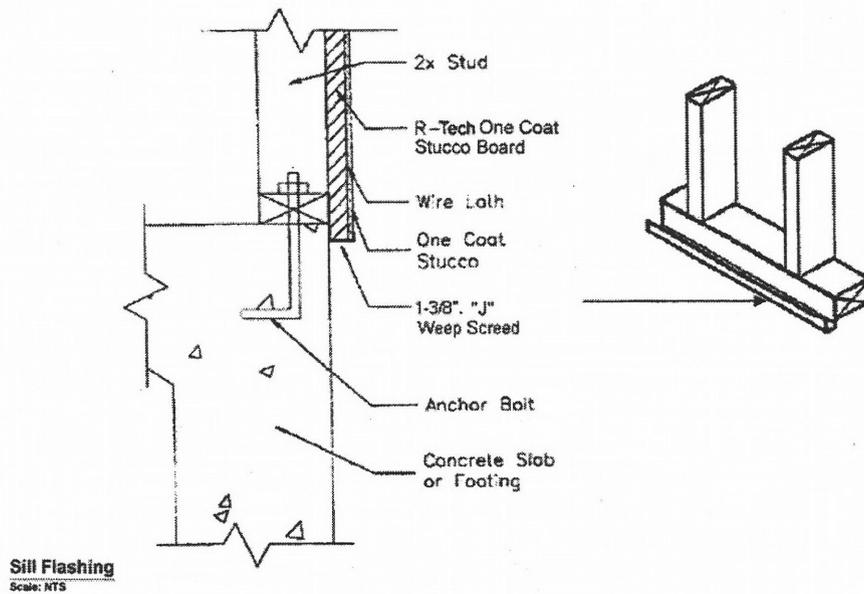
INSTALLATION DETAILS FOR R-TECH ONE COAT STUCCO BOARD INSULATION USED AS A WEATHER-RESISTIVE BARRIER
